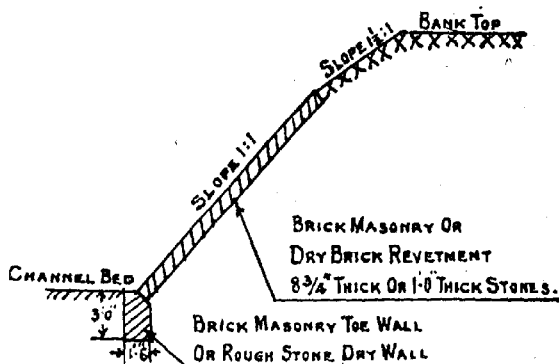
SINGLE BRICK THICK REVETMENT WITH MASONRY TOE WALL
